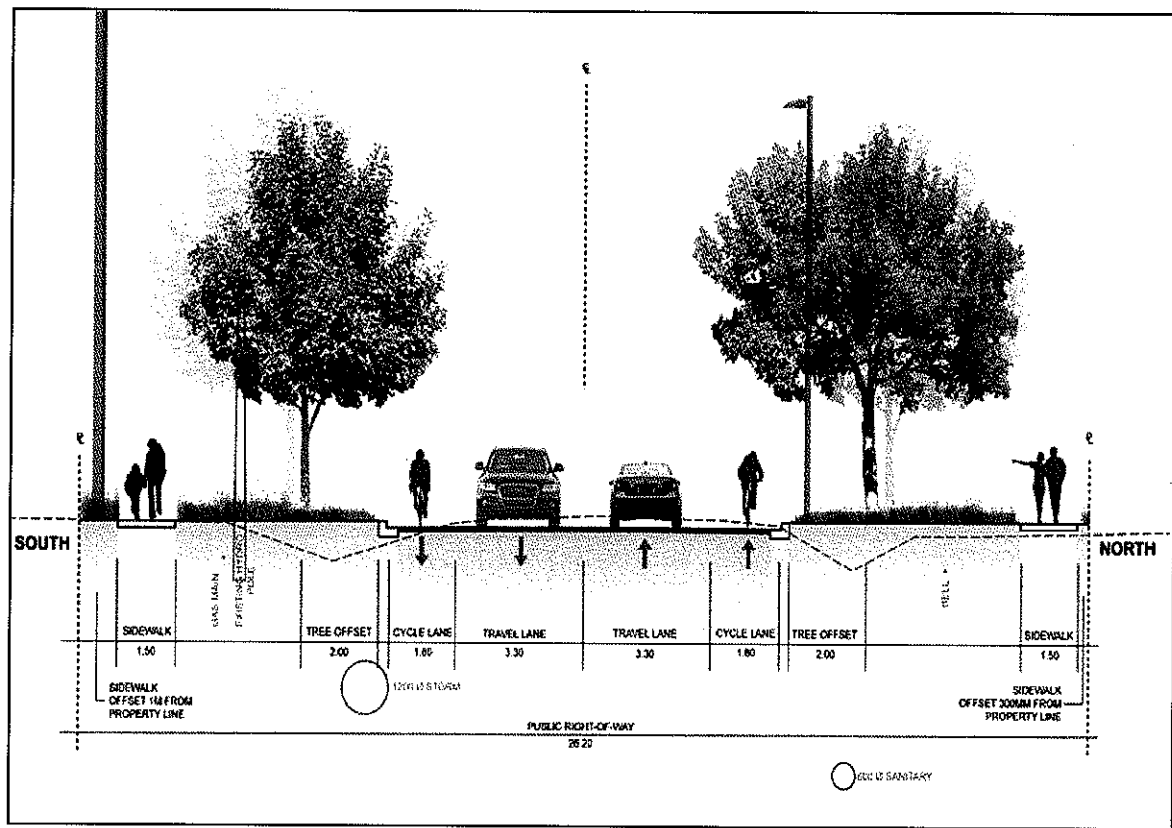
Recommended Typical Cross-Section for North Talbot Road Preferred Alternative
